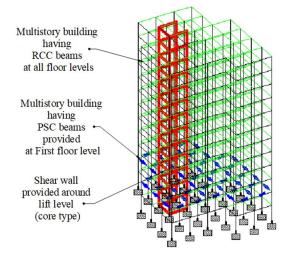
Model OPSC-BI - General Structure with PSC beam provided and interchanged at first floor level
